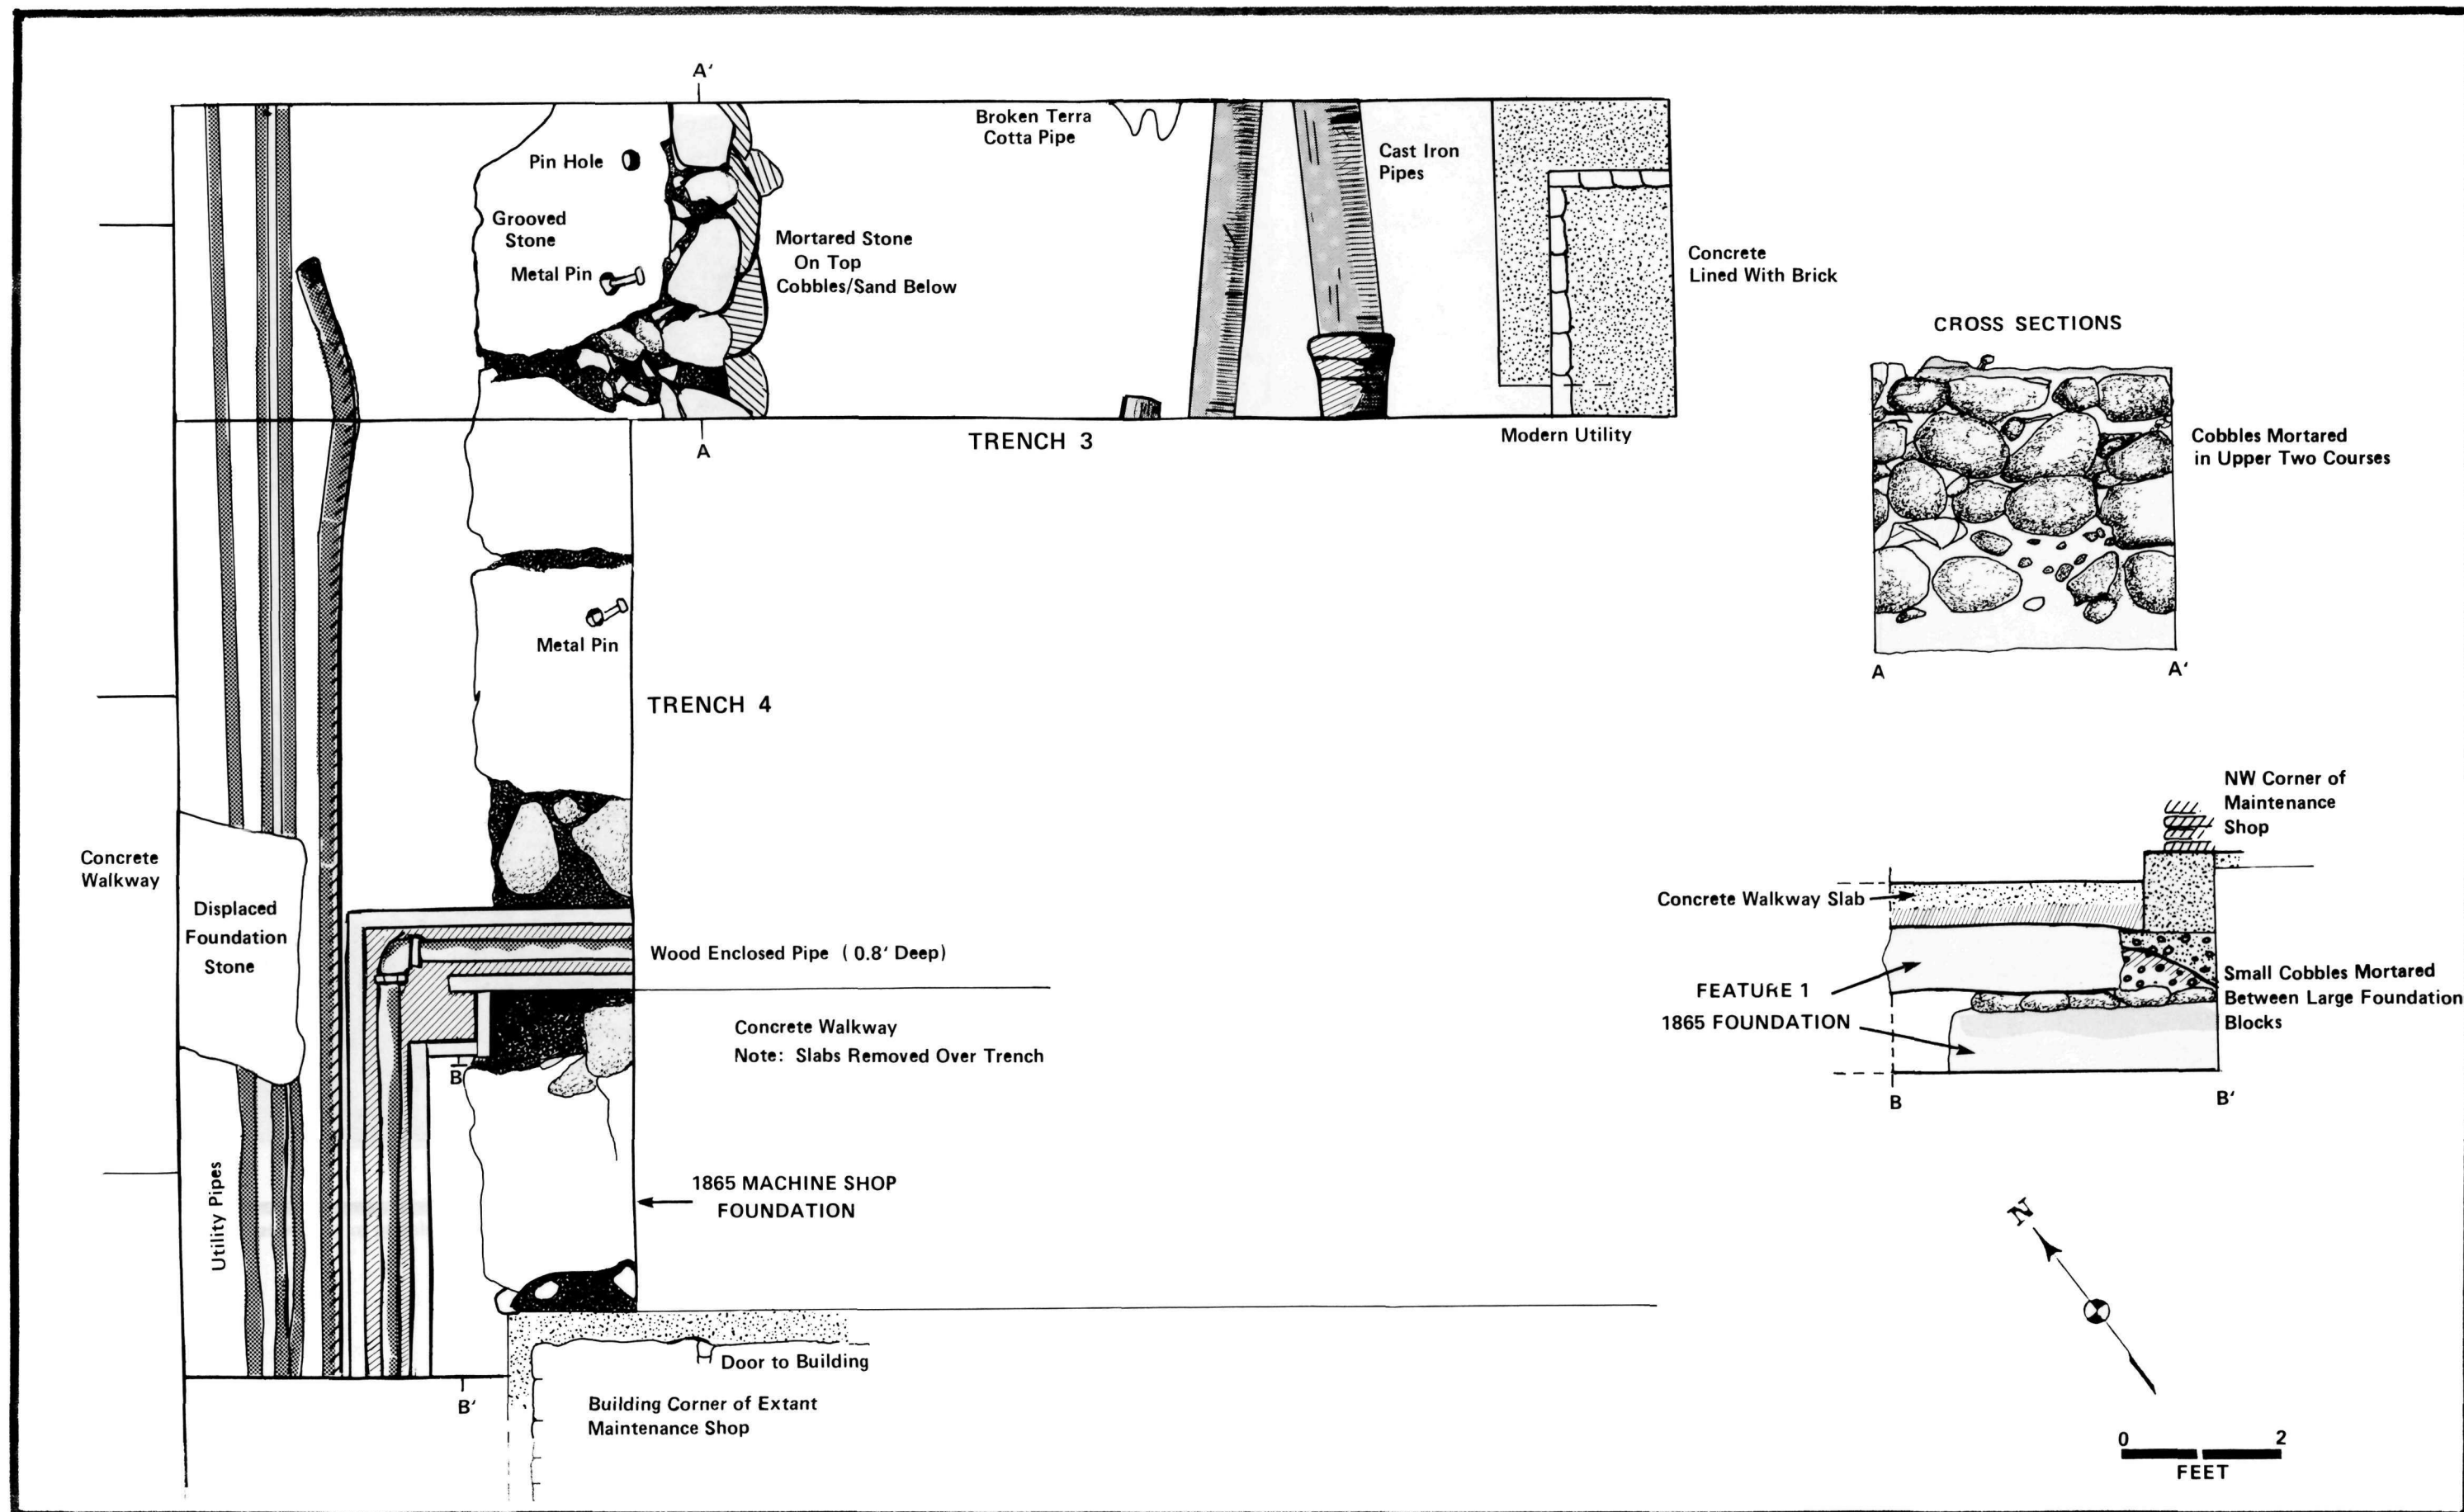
Plan View and Cross Sections of Trenches 3 and 4, Survey Area 6
